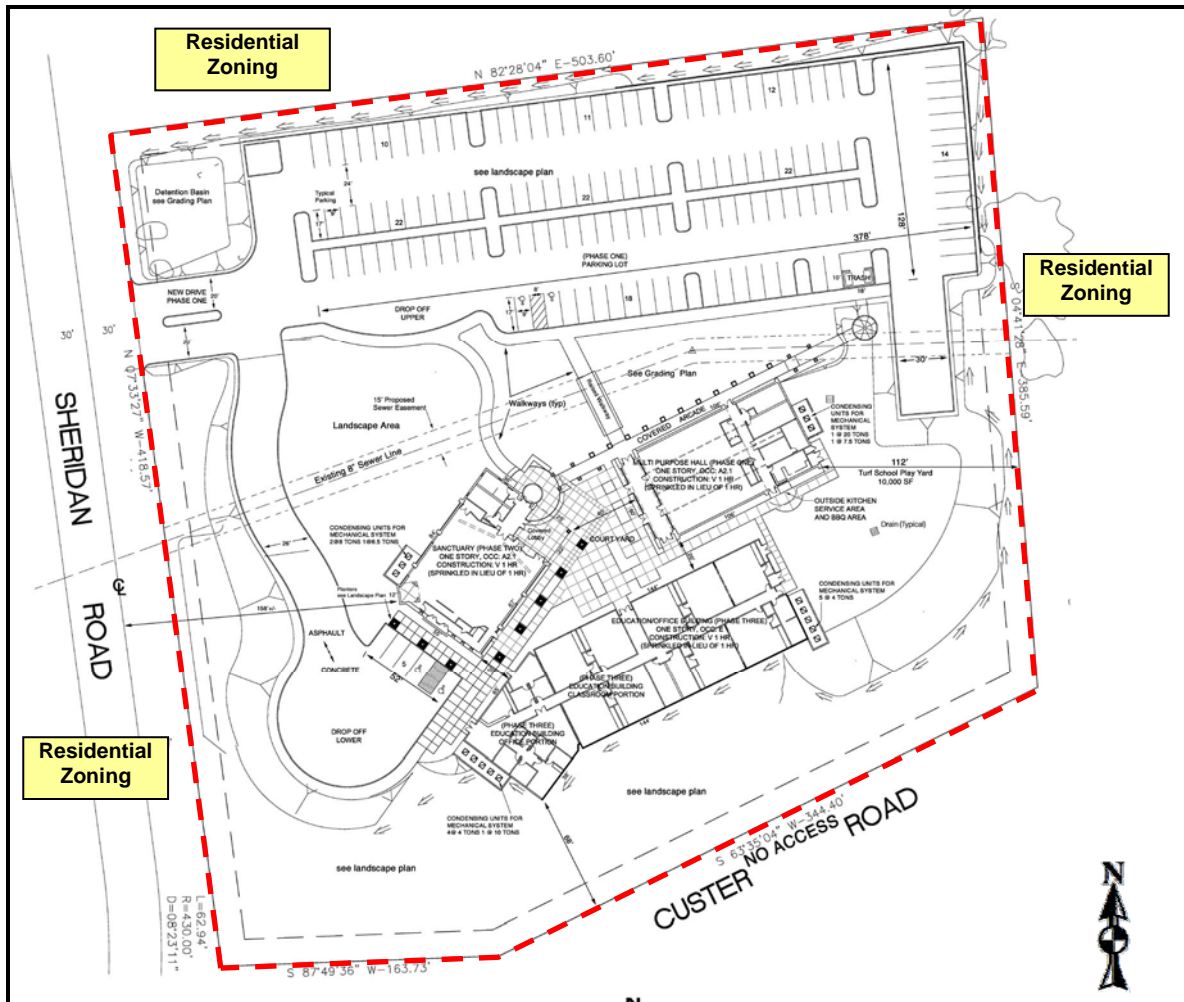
Proposed St. Adelaide Church Site Plan (CCBG Architects, Inc., 11/04)
